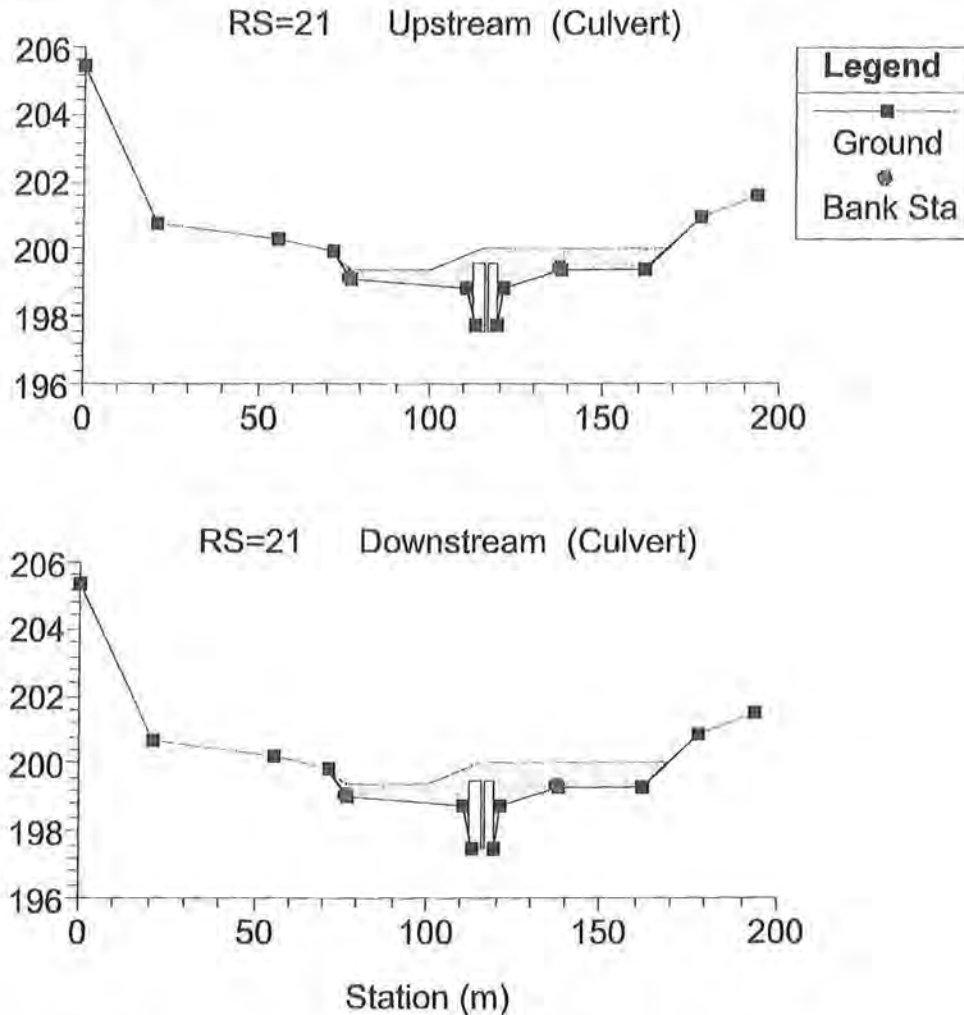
Cross sections upstream and downstream of box culverts looking downstream showing 31 m of low access road for major floods
